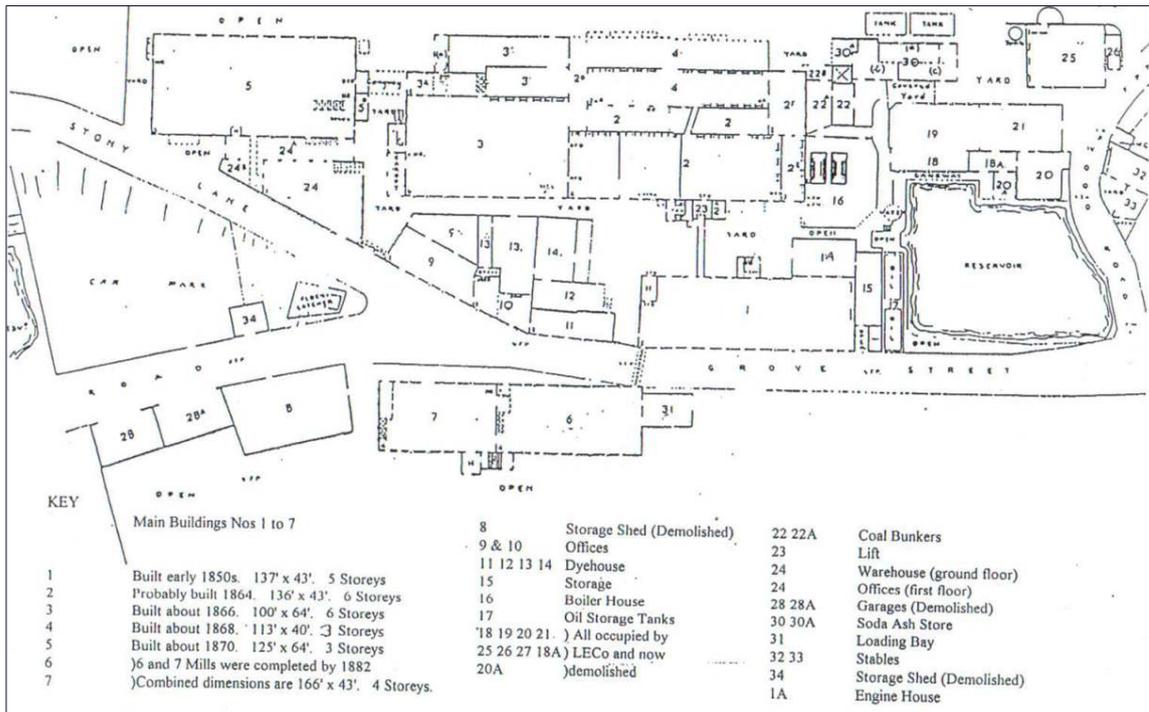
Site plan of Parkwood Mill showing the different buildings and features. Mill 6 and 7 are shown on the opposite side of Grove Street to the main complex (Source: Briden 2002)
